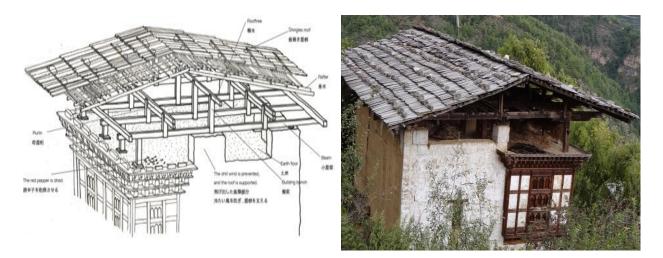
Bhutanese traditional roof configuration (source: CIT, 2010)
